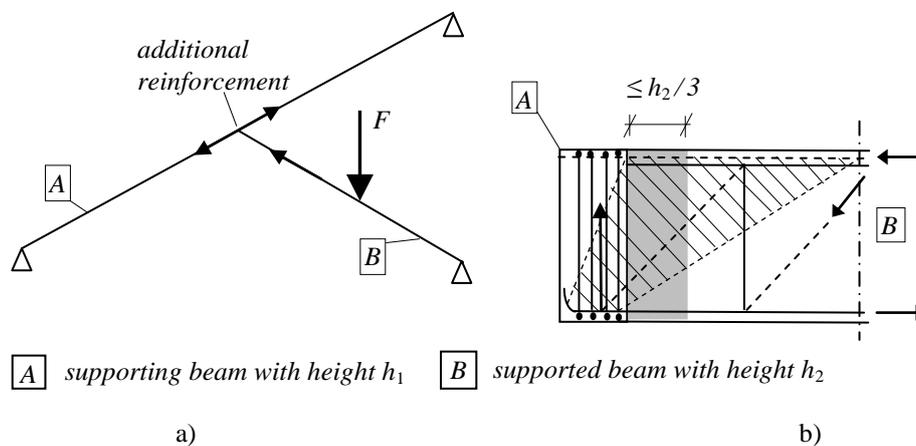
Additional reinforcement with the purpose to lift up the support reaction coming from below from the secondary beam, a) global view of the two beams in Figure 5.39, b) sectional view of the two beams in Figure 5.39. Figure b) is based on FIP (1999).
